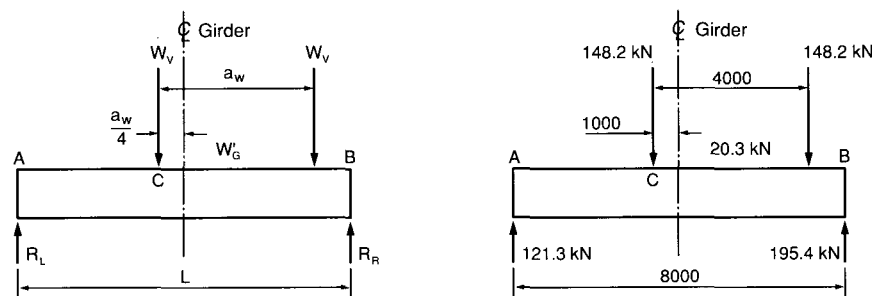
Worst case for bending moment caused by crane wheel loads (dimensions in mm)
